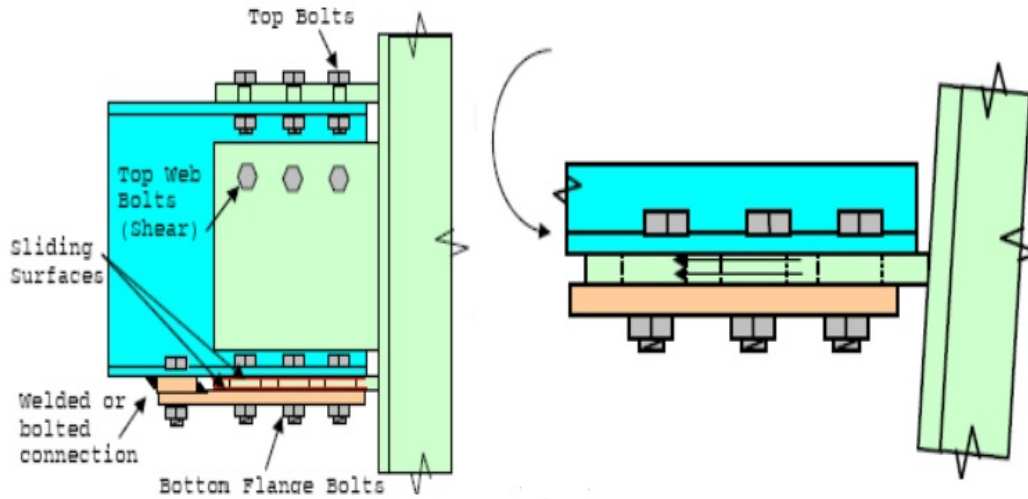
The Sliding Hinge Joint Details and Deformations (from Clifton et al. (2007)).
